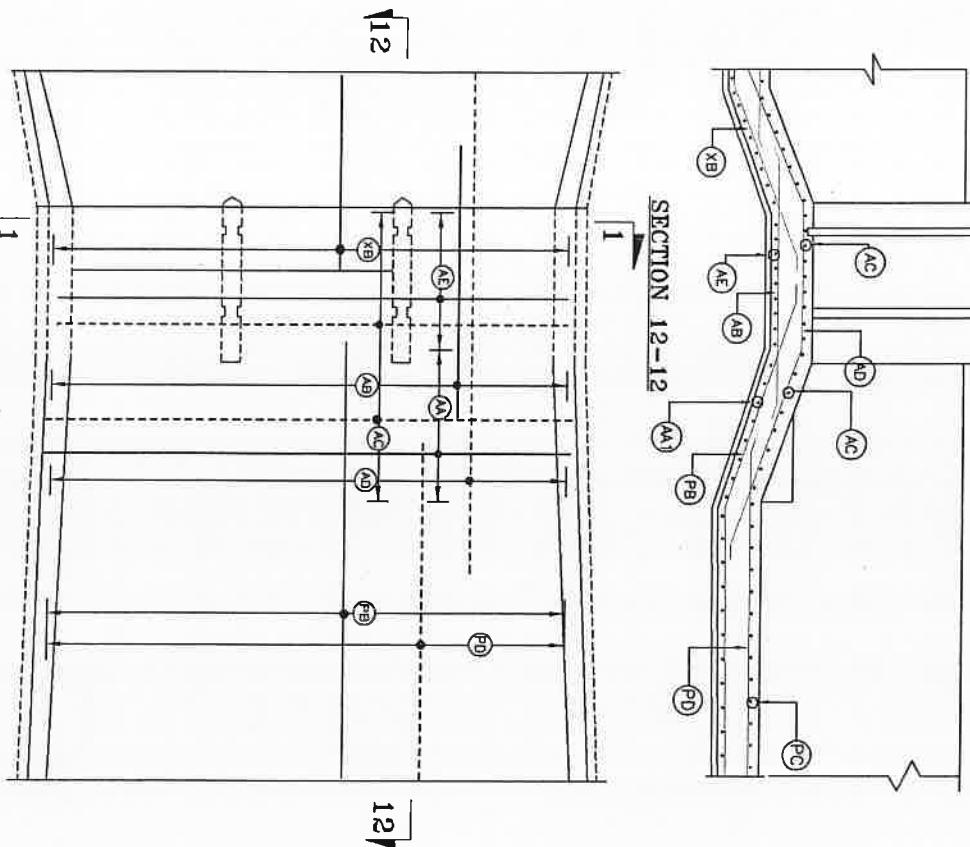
DETAILS OF CONSTRUCTION JOINTS (TYPICAL)
